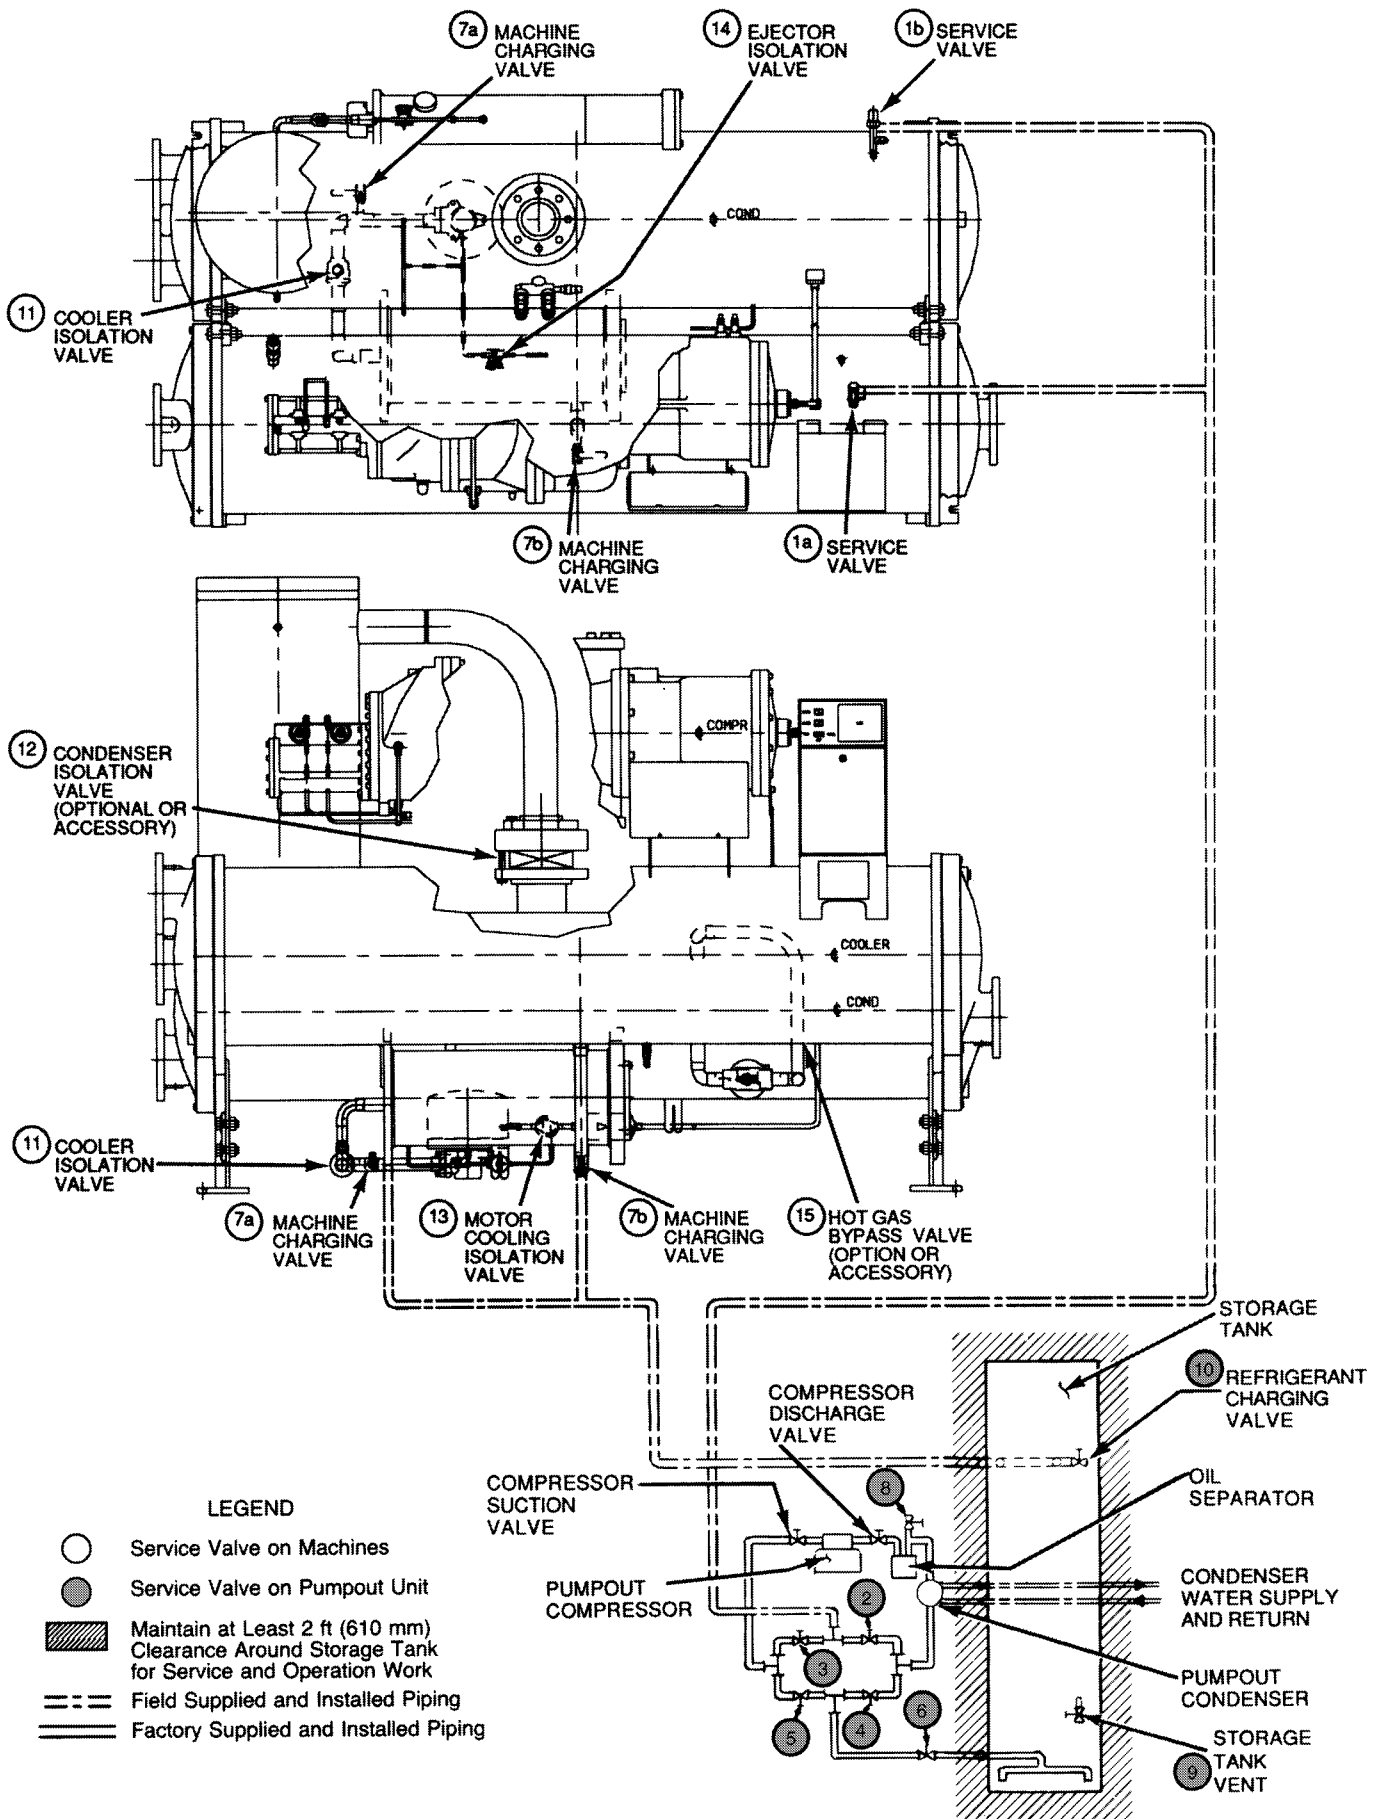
Typical Optional Pumpout System Piping Schematic with Storage Tank (Frame 1 and 2 Machines)
